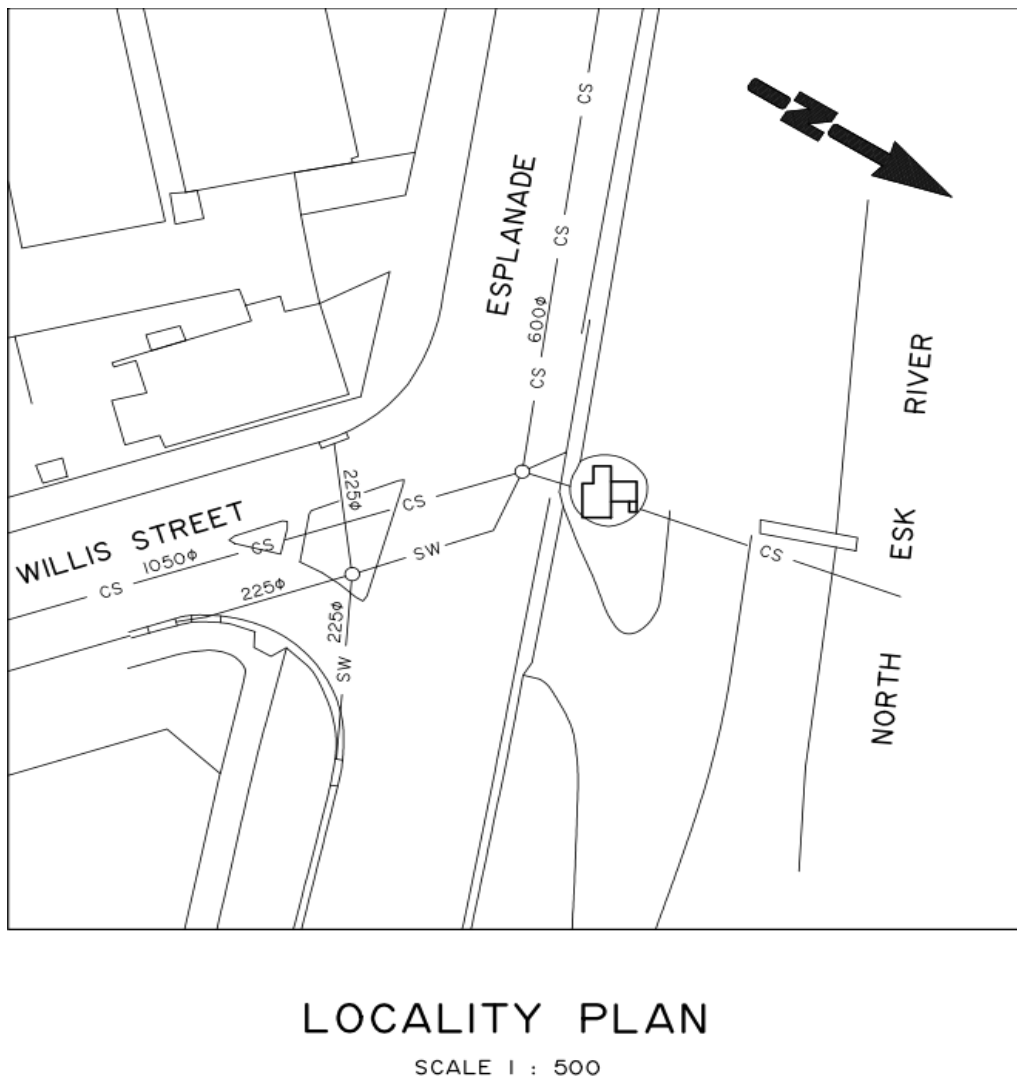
Willis Street SWPS Locality Plan (LCC, 2001)
